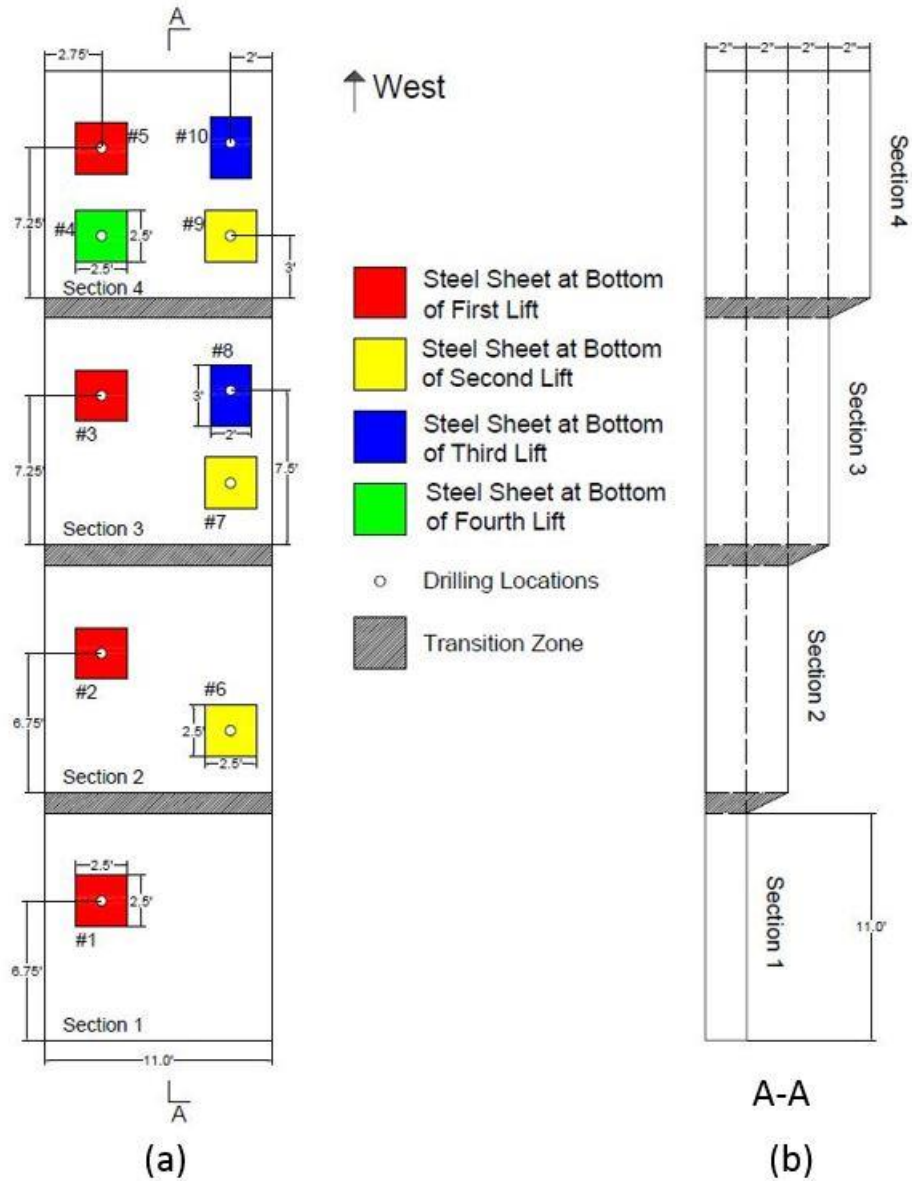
Test site configuration plan: (a) top view; (b) side view
